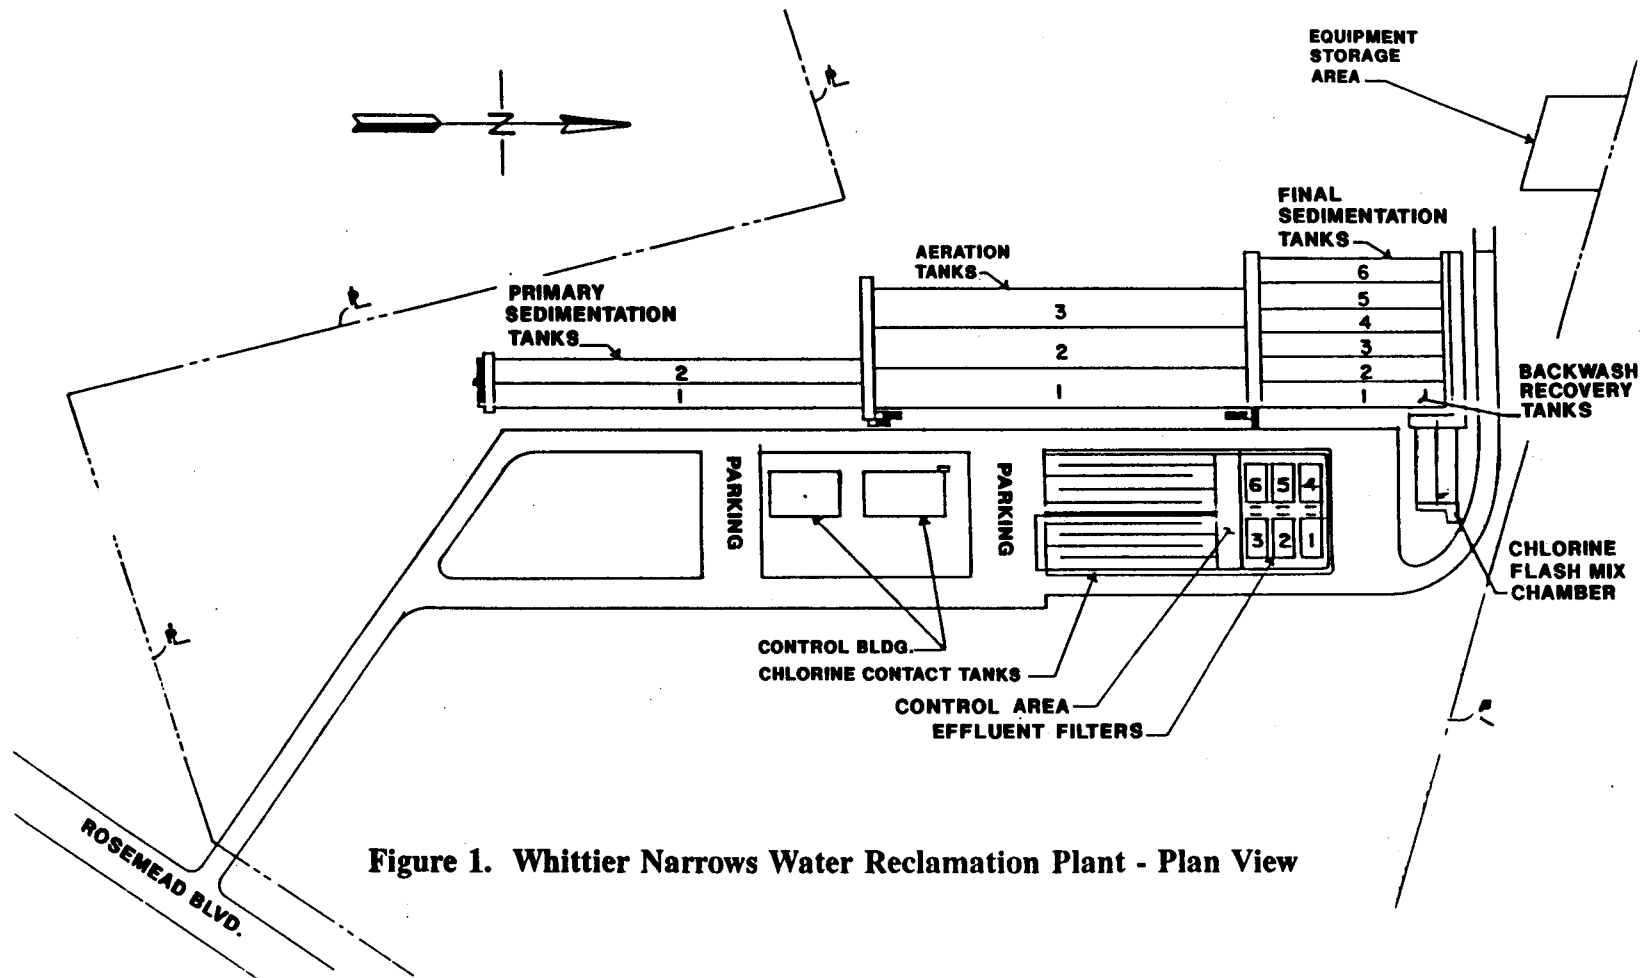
Whittier Narrows Water Reclamation Plant - Plan View
